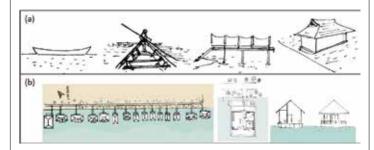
(a) The Island is accessed via boat from the mainland. Boat Service within 1 hour daily. Guests reach the island via a bridge. Floating cottages located to the west of Poovar island; (b) Plan, elevation and section of medium-sized Floating cottages located to the west of Poovar island.
